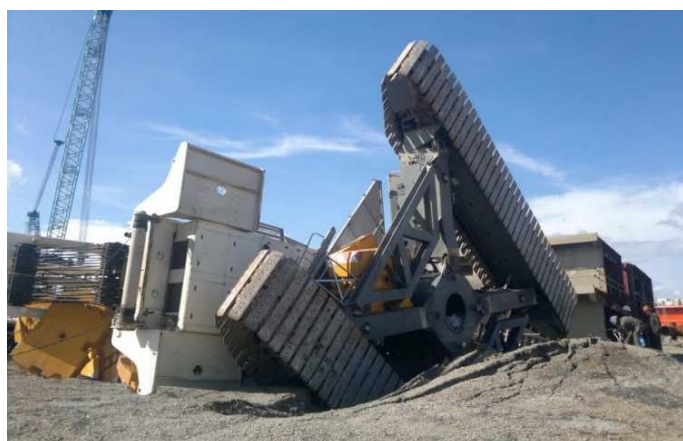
Bearing failure beneath heavy tracked crane
